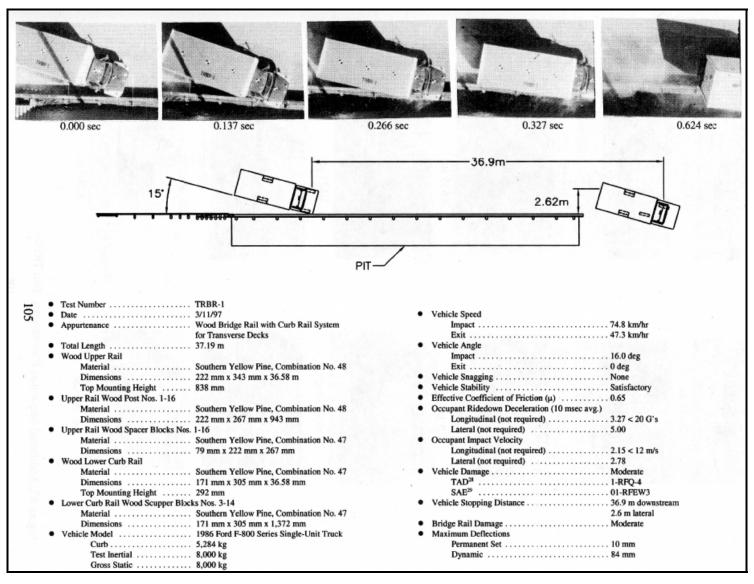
FPL Glulam Bridge Rail TL-4 Test 1
